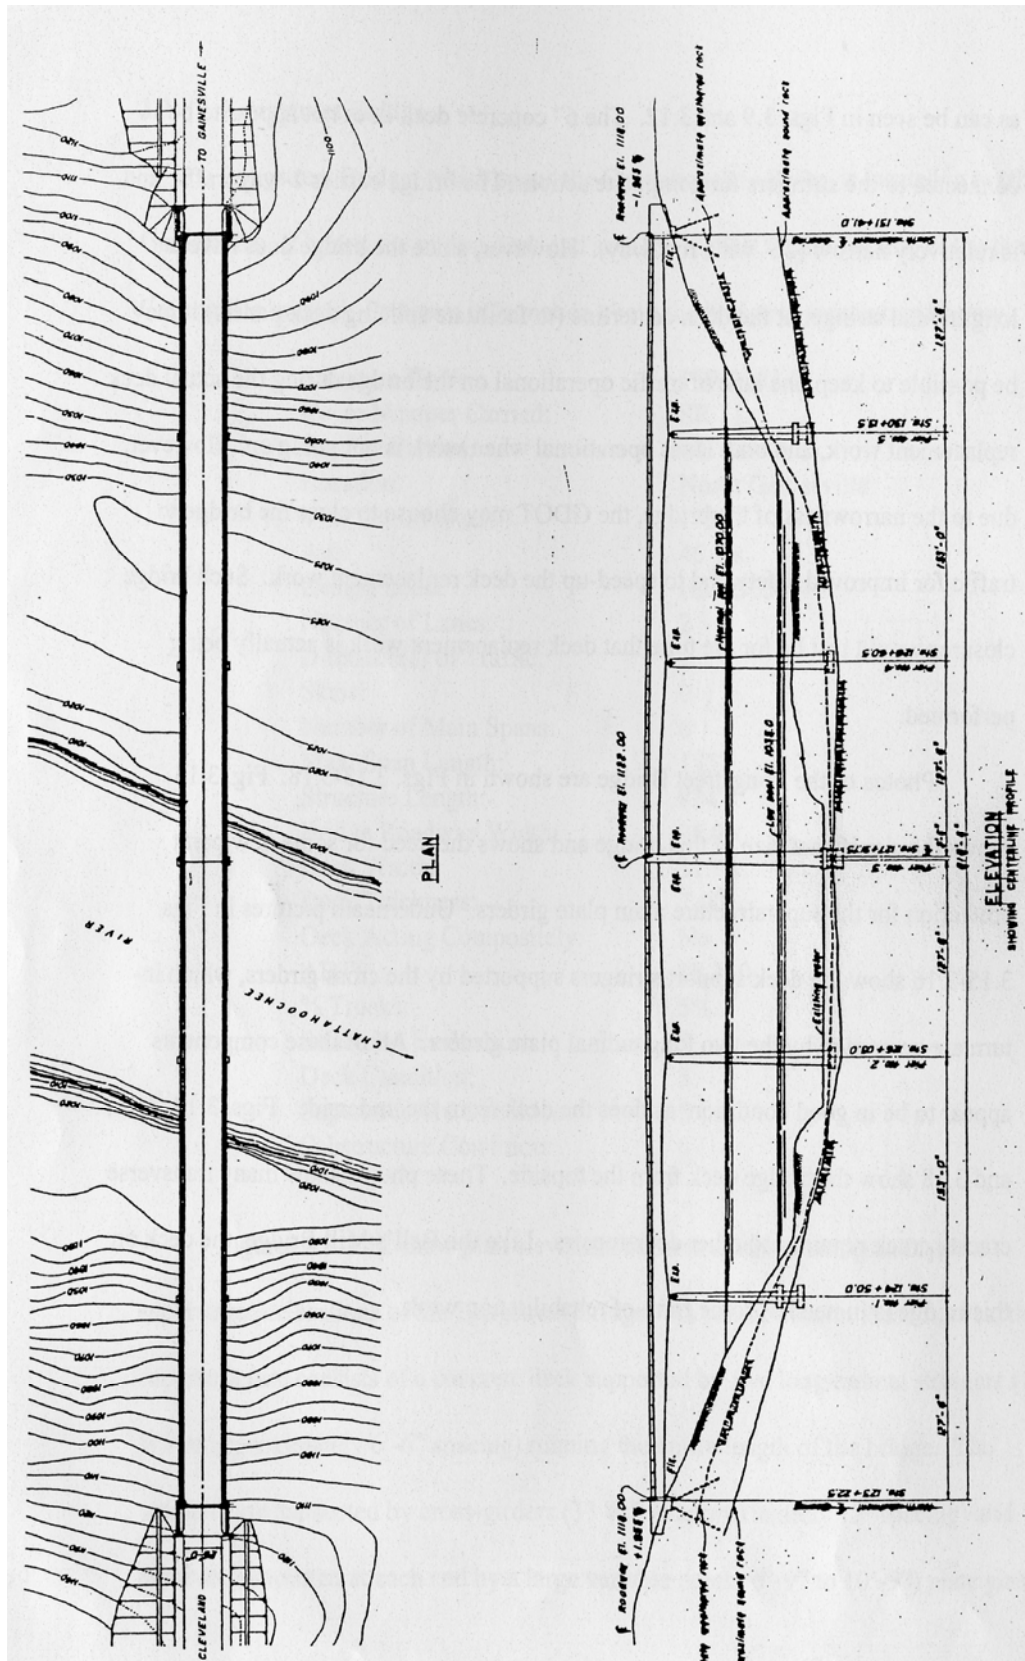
Plan and Elevation of Longstreet Bridge (2)
